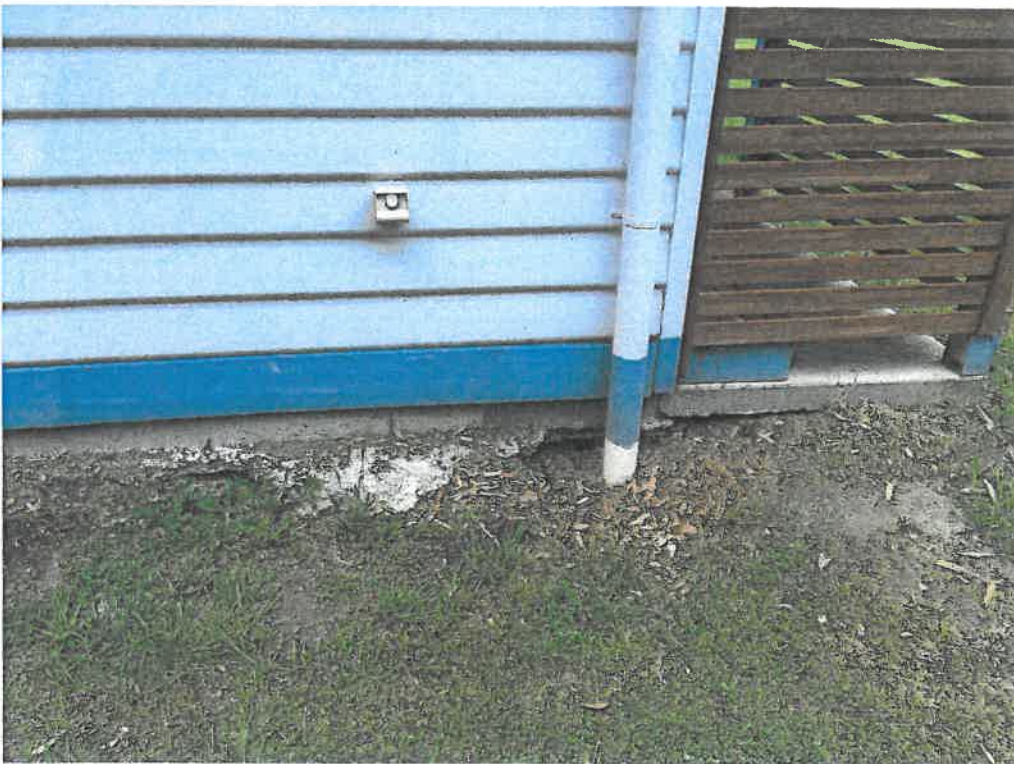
Willatook-Warrong Road Warrong 3282 sec137b report
